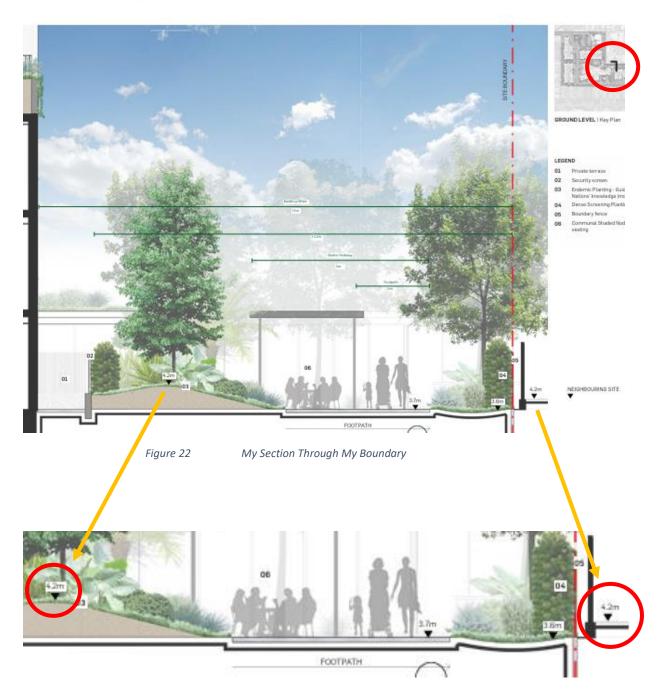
Heights Nominated on plans incorrect. Ground level above my floor level.
